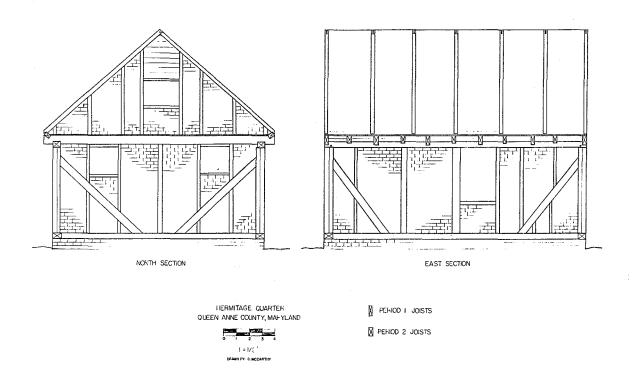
Hermitage Quarter, framing sections of north and east walls.
